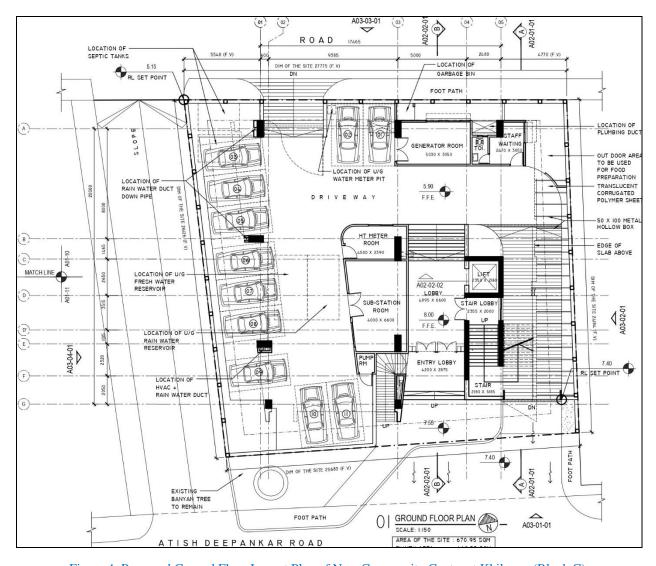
Proposed Ground Floor Layout Plan of New Community Center at Khilgaon (Block C)
